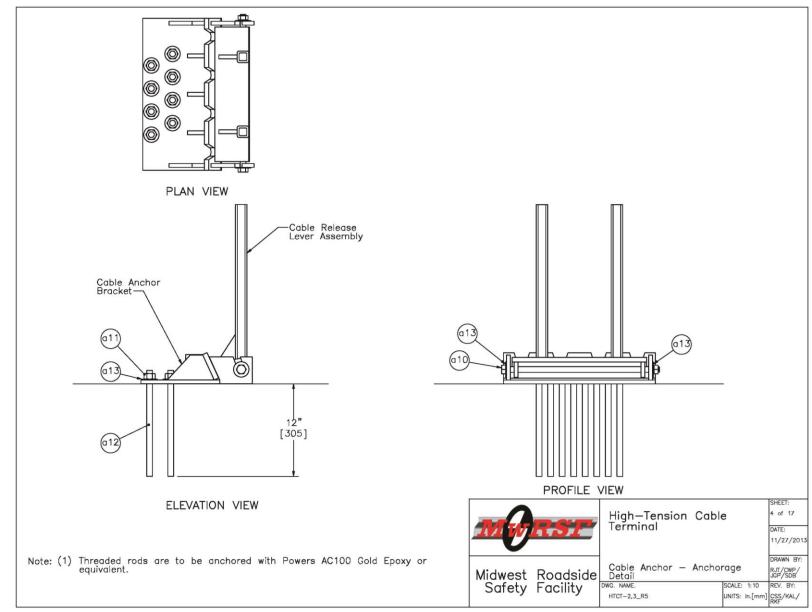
Cable Anchor Anchorage Detail, Test Nos. HTCT-2 and HTCT-3
